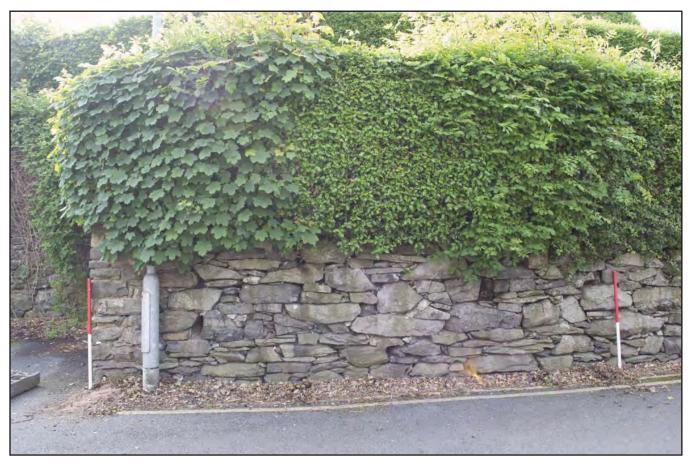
Wall E, 1st 5m section (pre-commencement survey)
